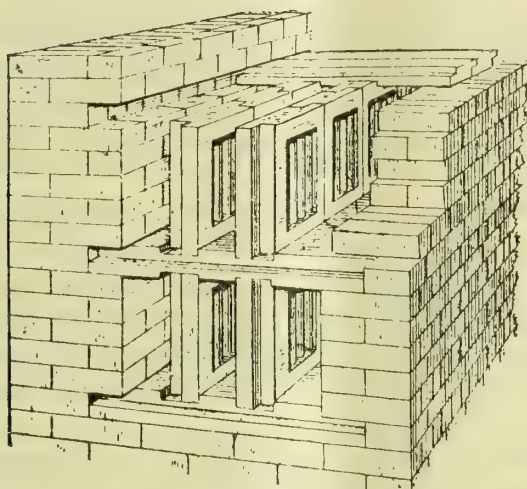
is a sectional plan and elevation of a fragment of a division-wall formed of these special tiles or bricks. Fig. 2 is a perspective view of part of a regenerator furnace, showing one way of applying the corrugated tiles to divide the waste-heat flues and air-passages.
